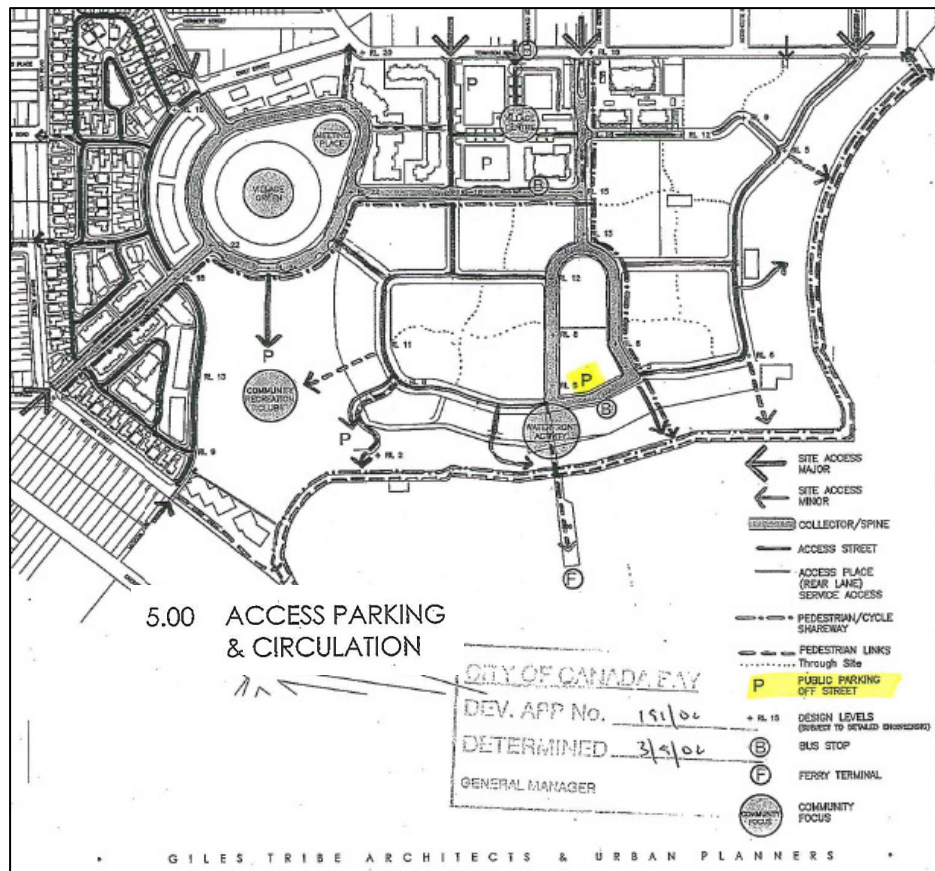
Extract from the Breakfast Point Masterplan 2002 – Nominated location for Marina Parking on site (subject Waterways, Planning NSW consent) for 100 spaces
